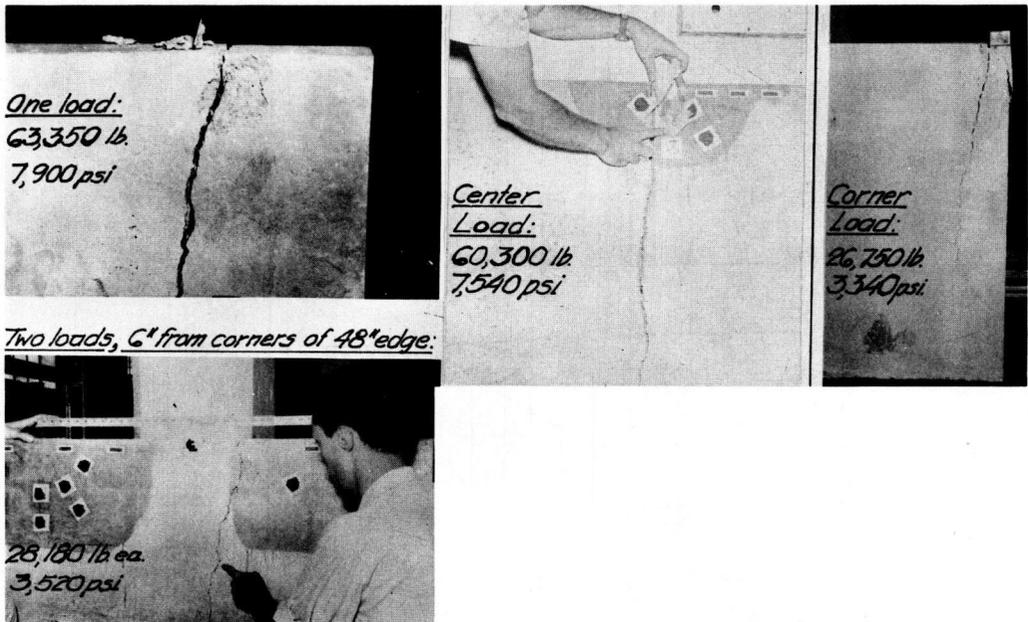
Typical test slab conditions after failure, for single load at center of edge, at one corner, and 6 in. from one corner, Bottom view shows crack near center between two symmetrical loads.
